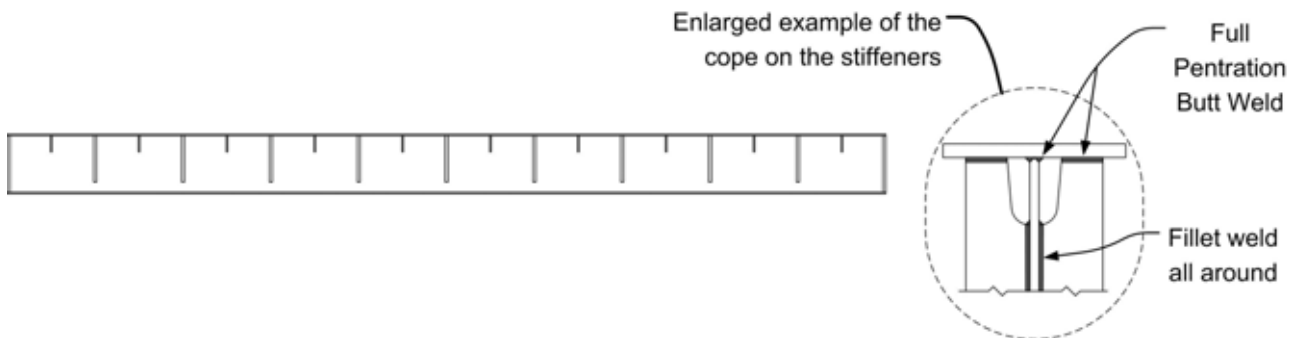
The modular layout of the crane runway girder indicating the welds and cope that should be associated with all crane runway girders.
